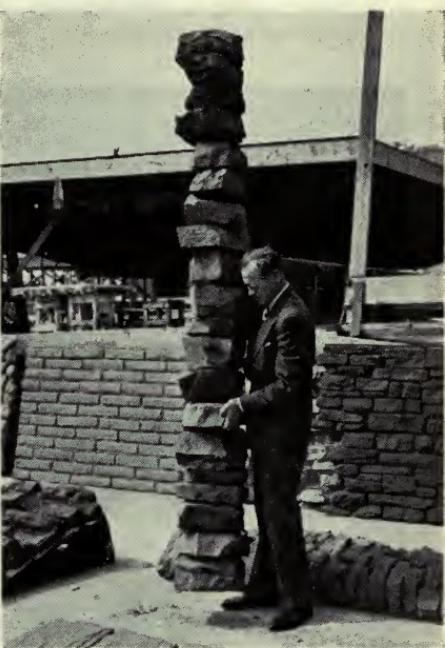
Rock column made from glass fiber-reinforced polyesters. Brick wall and stone wall units fabricated from same material.
